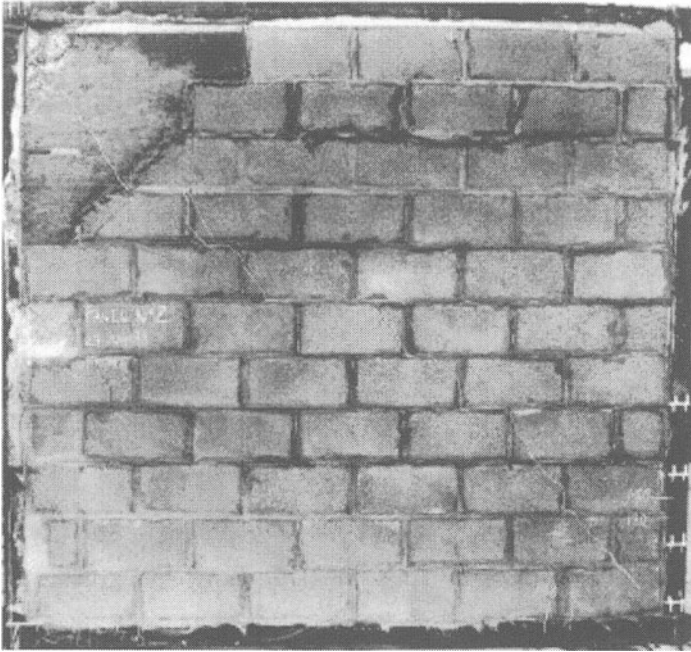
Steel frame with hollow concrete blockwork infill with 0.4 per cent vertical reinforcement in cores. Splitting of block at loaded corner
